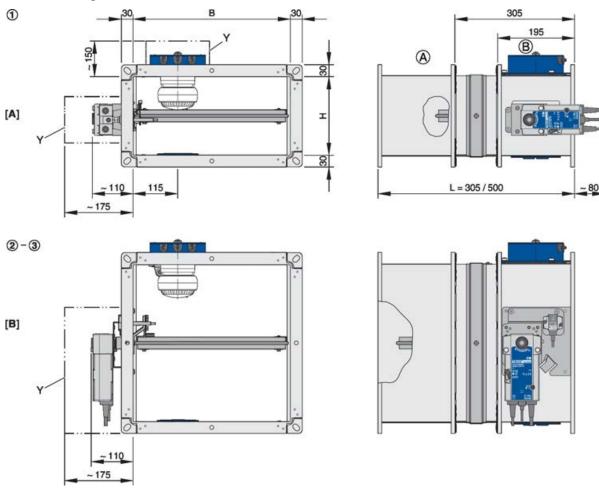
FKA2-EU with Belimo spring return actuator and duct smoke detector
